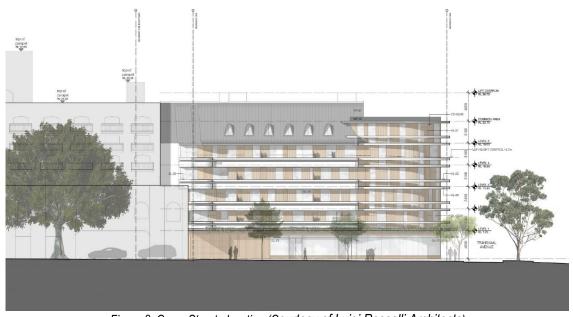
Cross Street elevation (Courtesy of Luigi Rosselli Architects)
